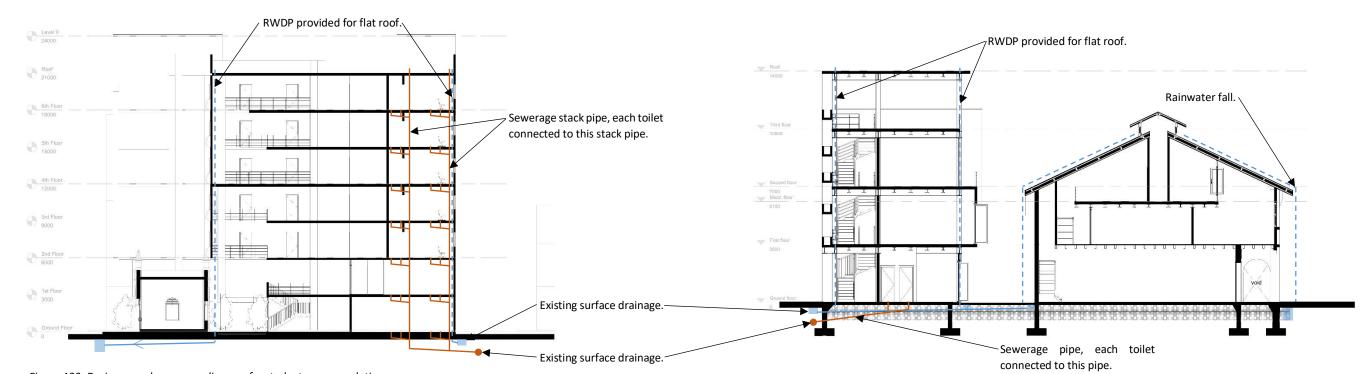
Drainage and sewerage diagram for shophouse (classroom).
